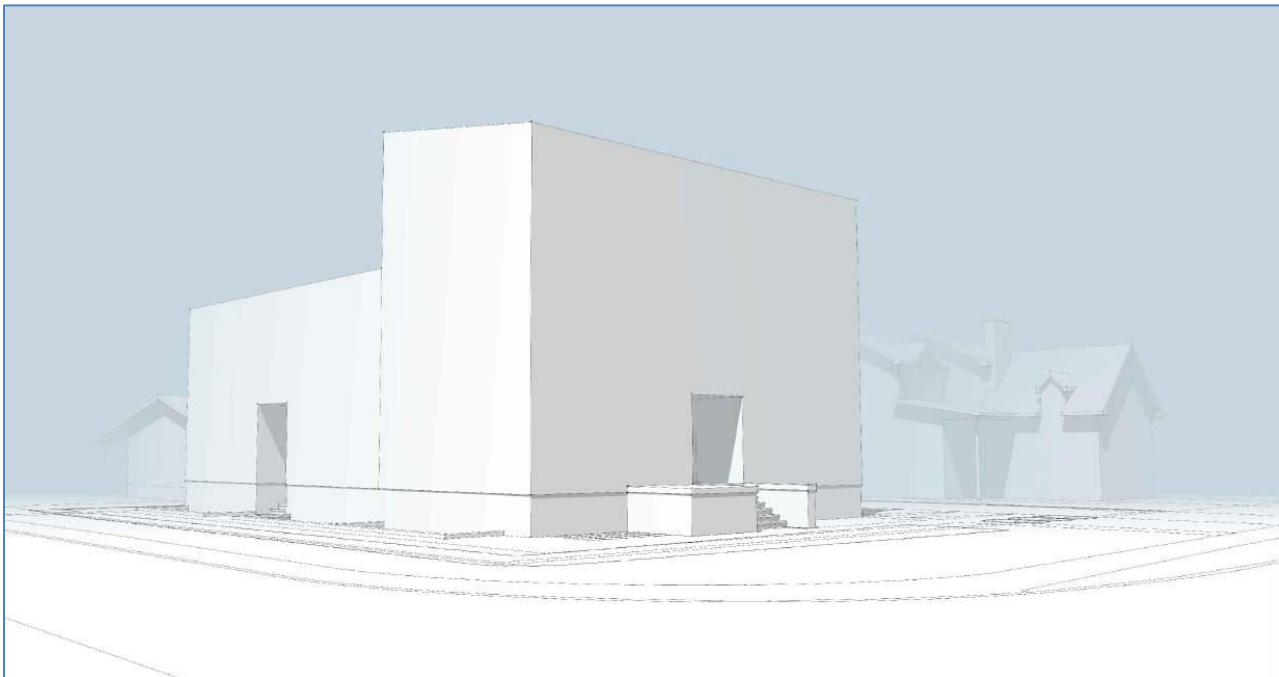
proposed building mass, view from the intersection of Jeanne-d'Arc Boulevard N. and Champlain Street. Source: Paul A. Cooper Architect, dated December 21, 2023. /
